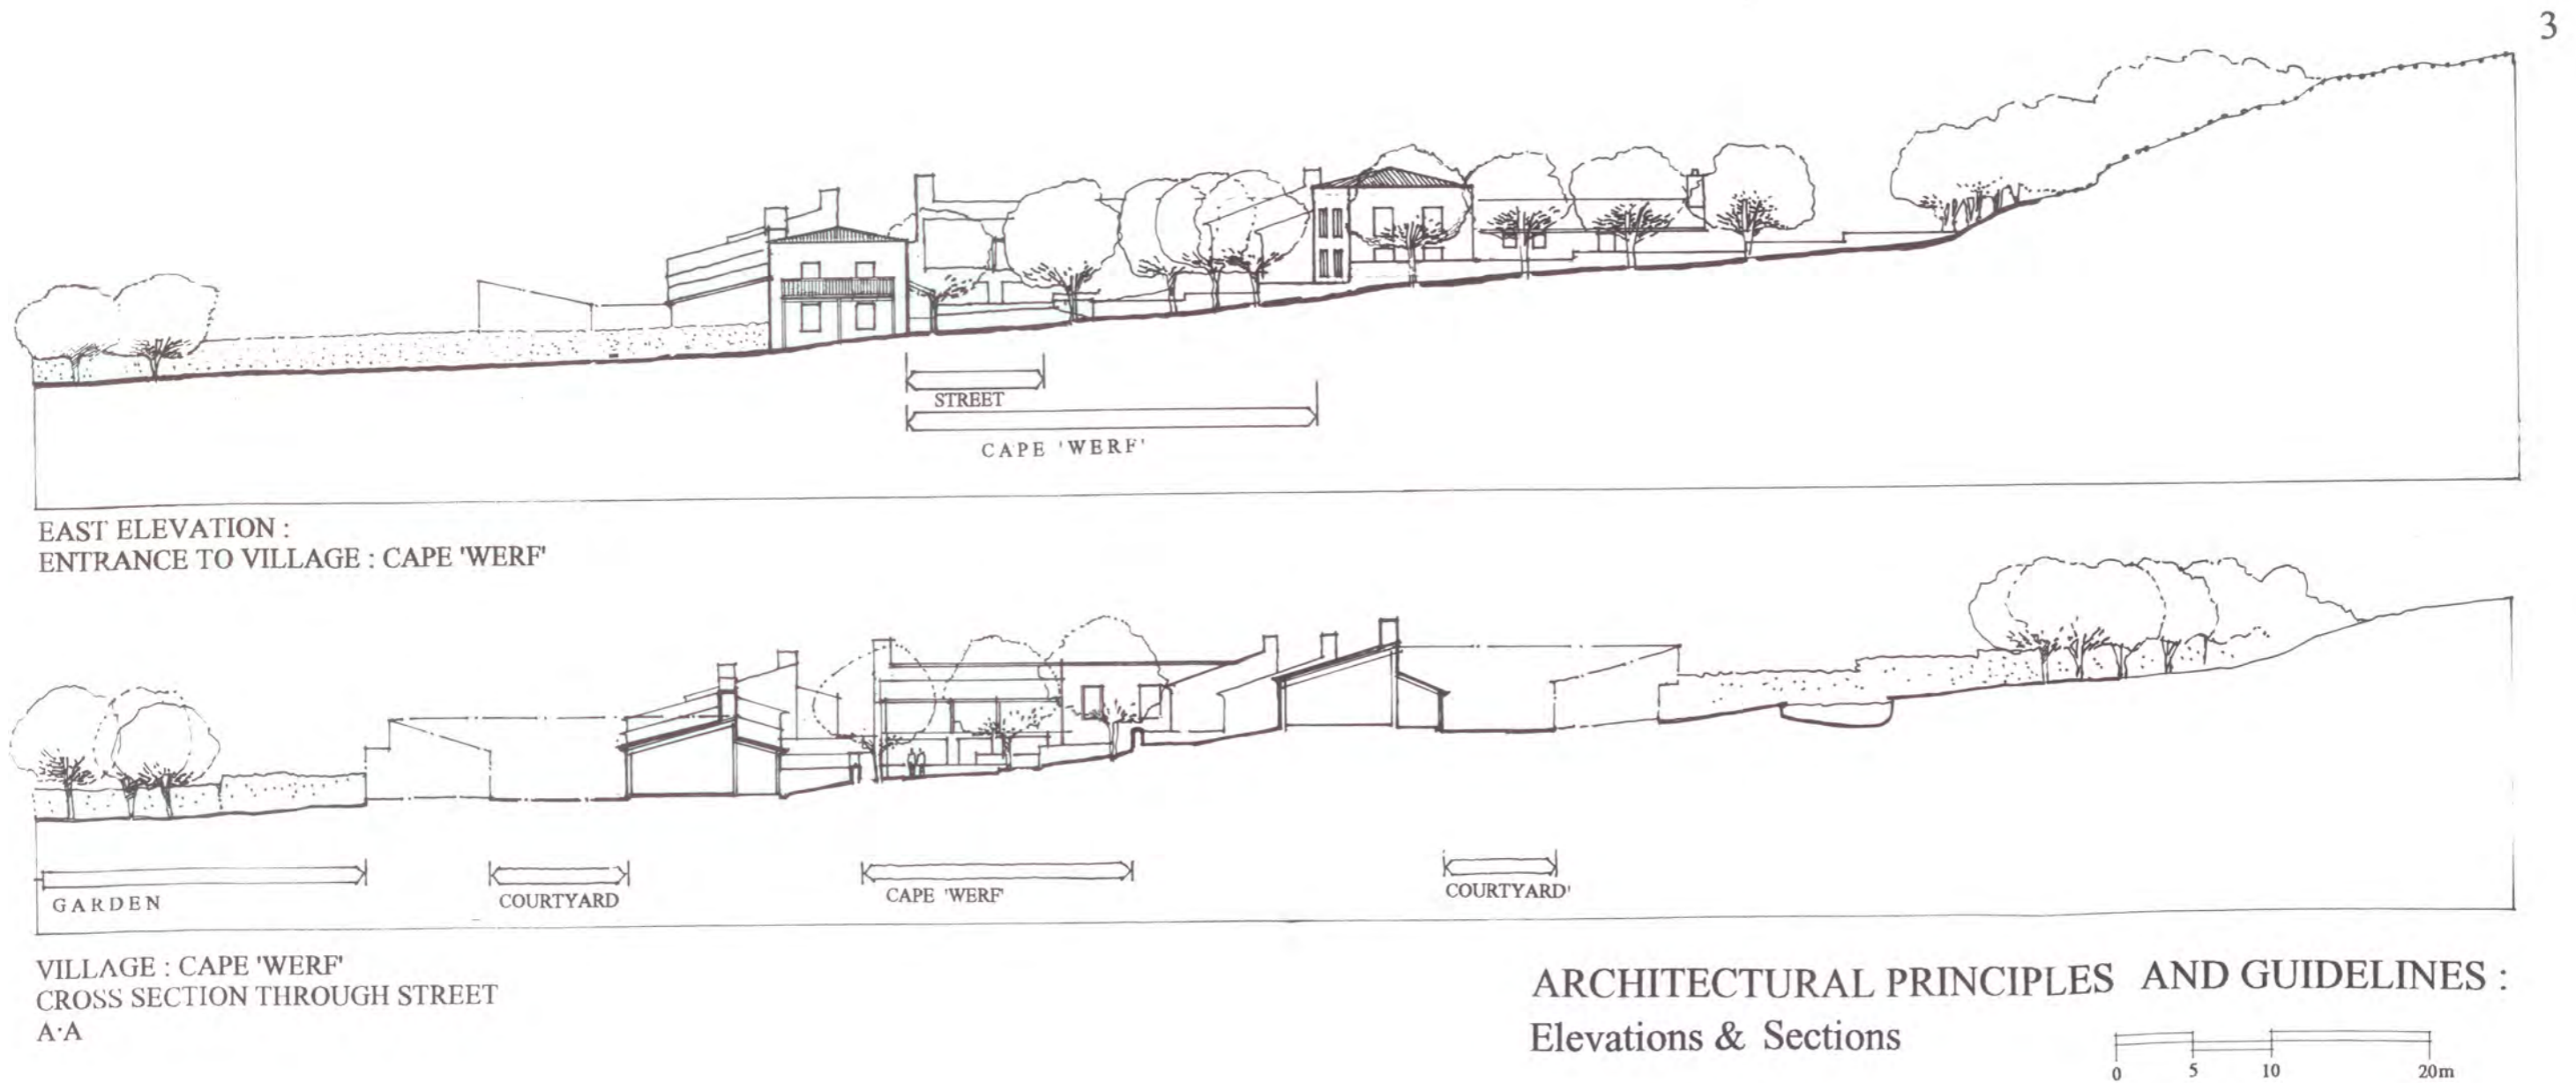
Architectural Principles: Elevations and Sections - P. Louw & M. Kruger
